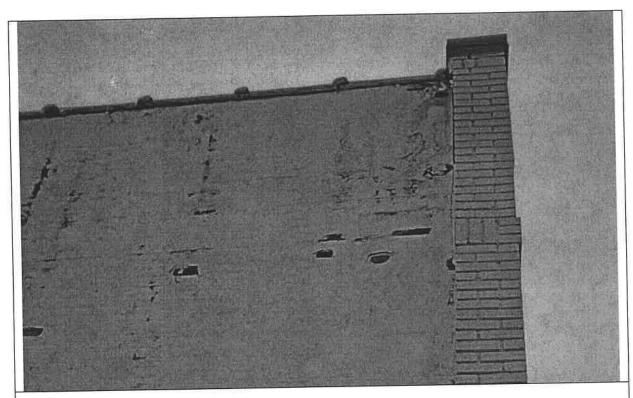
West End of South Exterior Wall: Note separation indicative of out of plane wall displacement.
